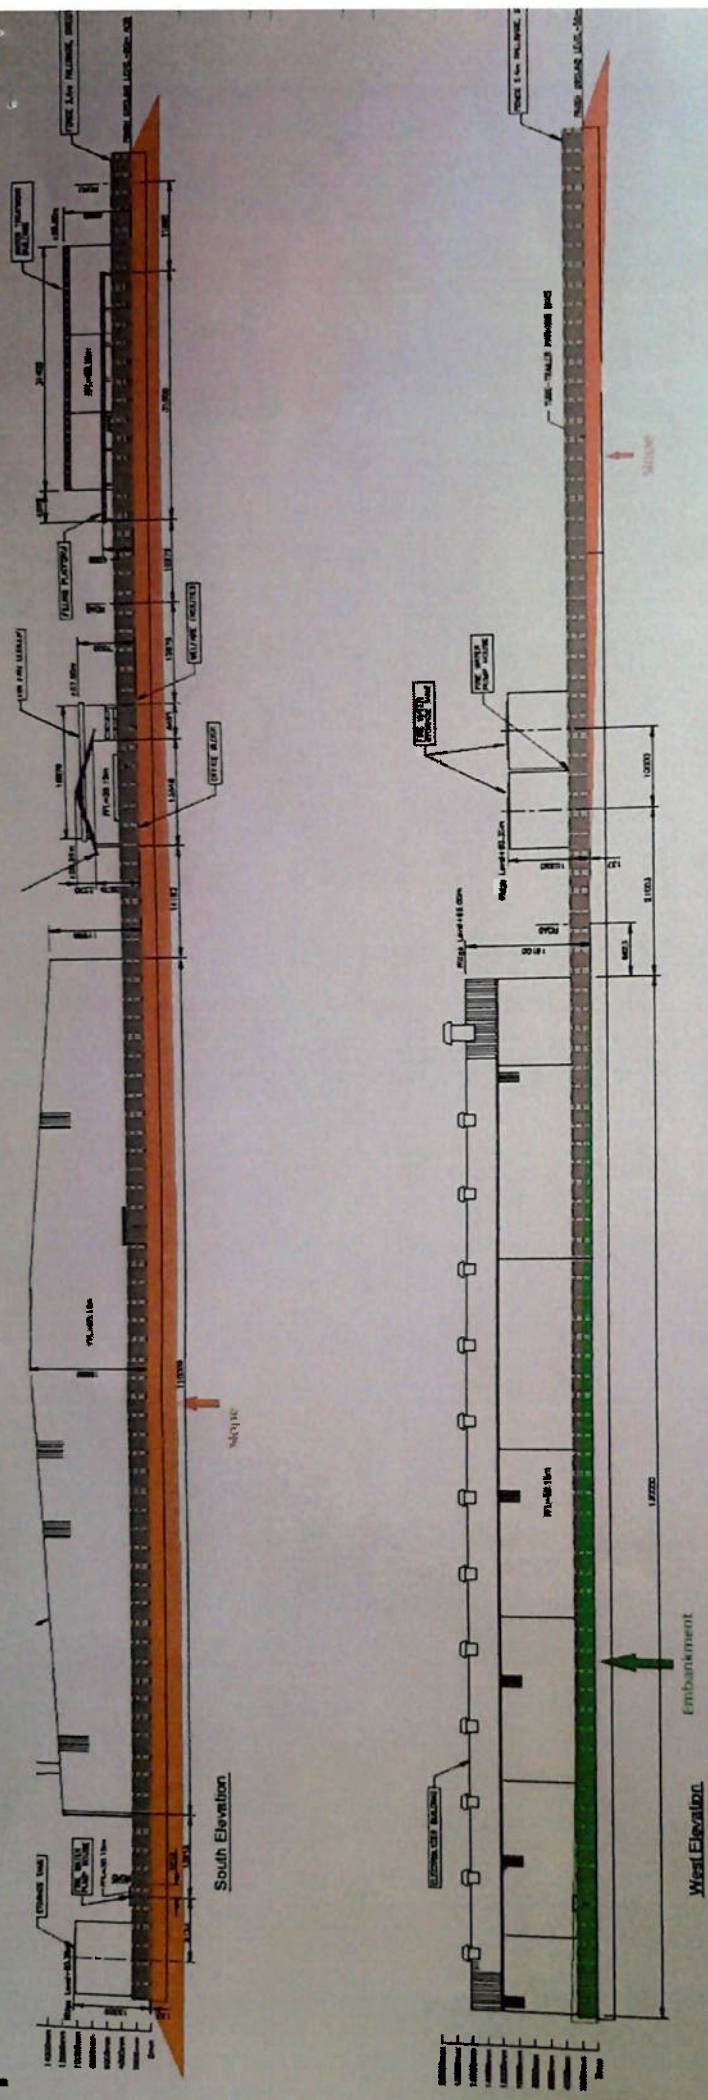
Hydrogen Plant elevations showing re-profiled landscape immediately adjacent
